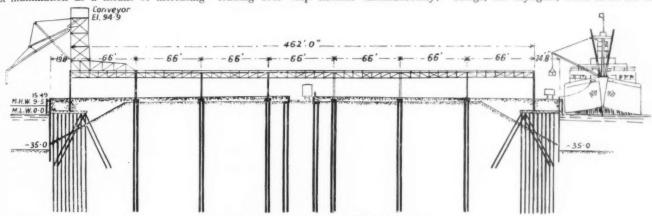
Typical cross-section of Hoosac Pier No. 1.
